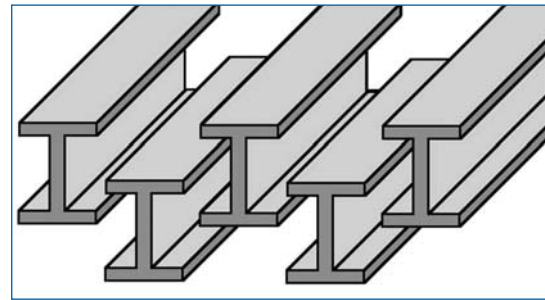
High PRI value could be achieved by steel girders moving alternatively
